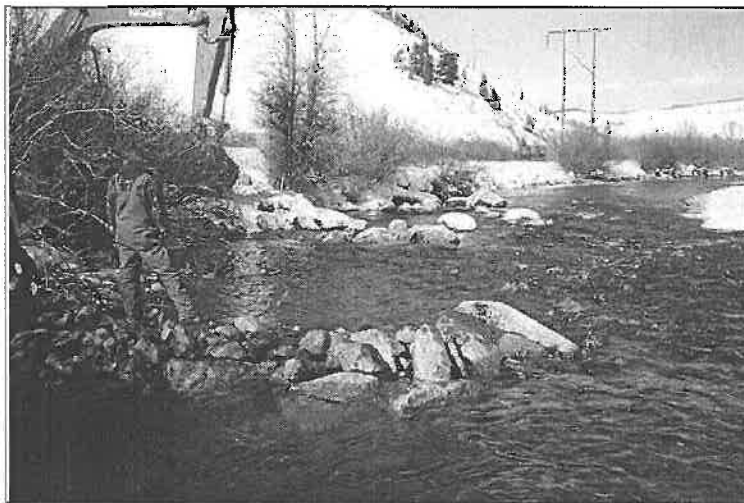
Bendway weirs installed on the Blue River near Silverthorne, Colorado (CDOT).
